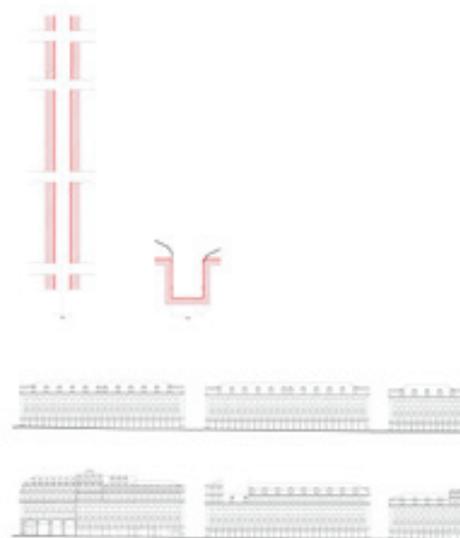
Width and façade designs the street. Augusta Street, Lisbon: 1. Street plan. 2. Comparison between Section-type and Built section. 3. Comparison between Façade-type and Built façade
